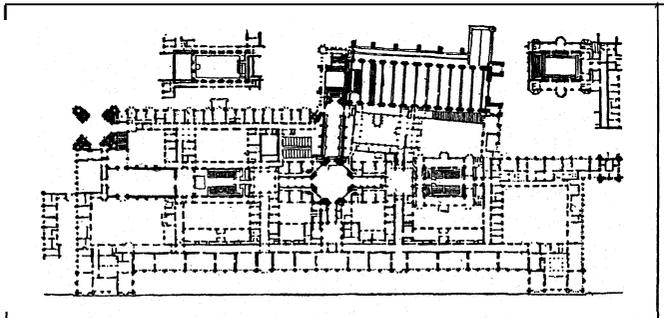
PLAN OF PRINCIPAL FLOOR, HOUSES OF PARLIAMENT. WESTMINSTER
